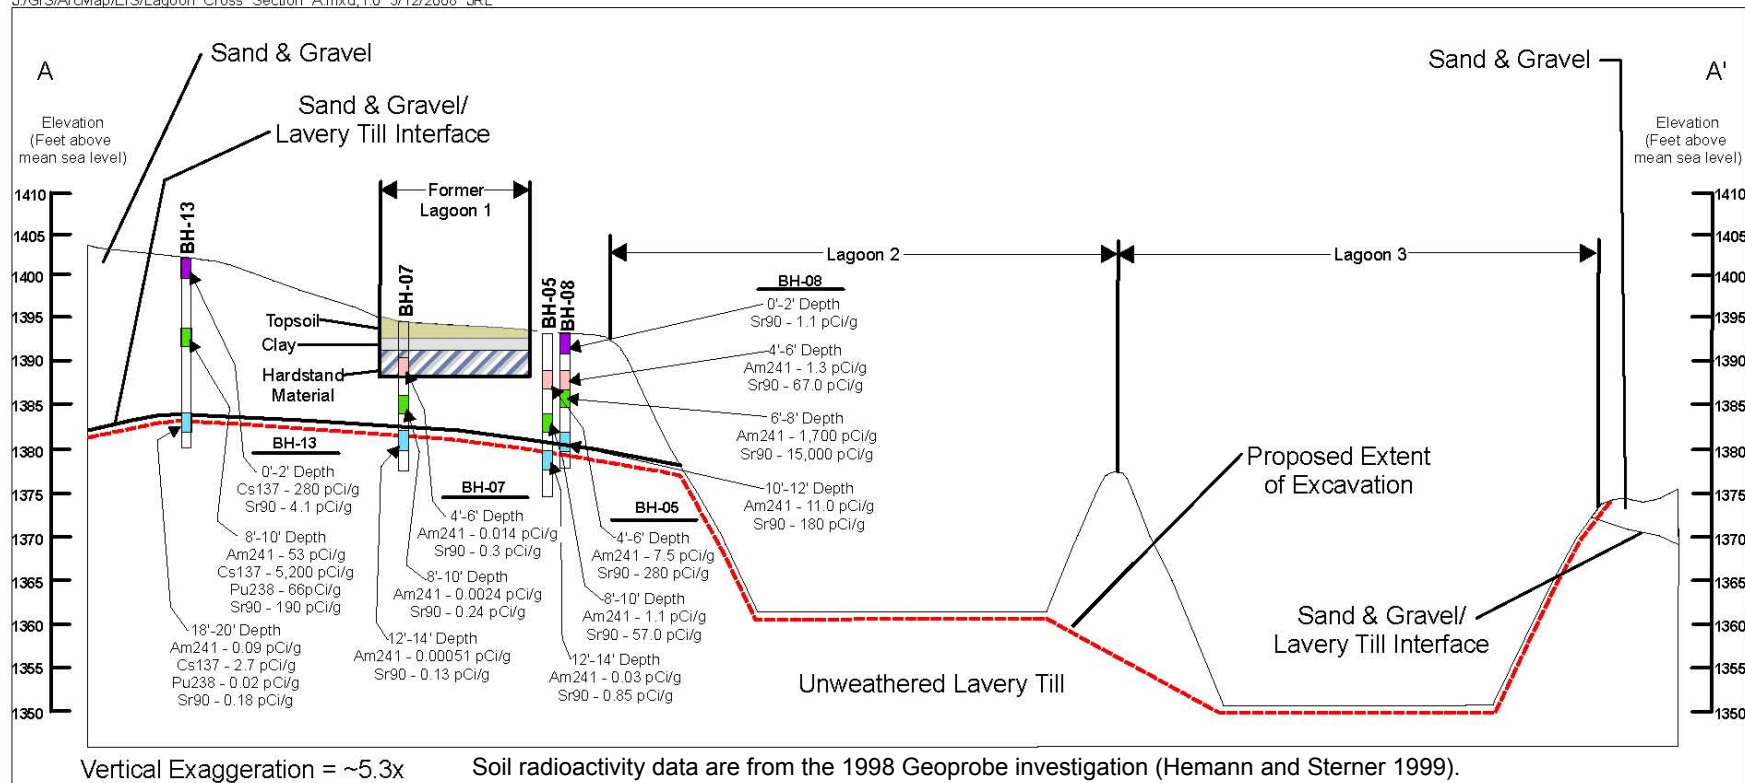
Conceptual Arrangement of WMA 2 Excavation, Cross Section
